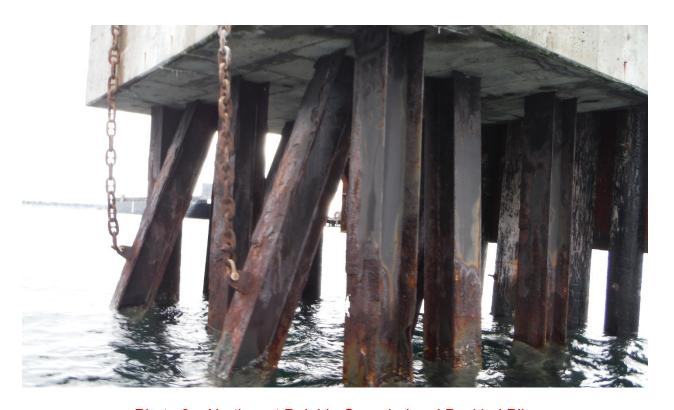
Northwest Dolphin Corroded and Buckled Pile
